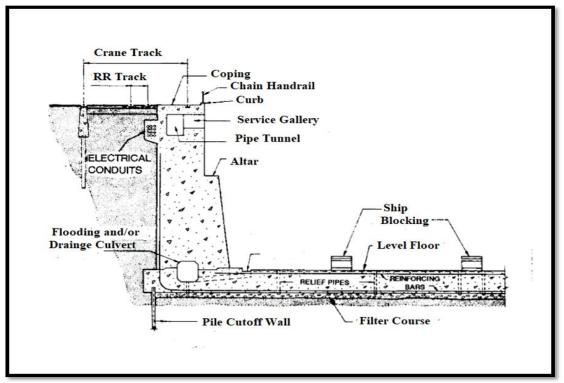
Cross section of drydock (Unified Facilities Criteria, 2012)
